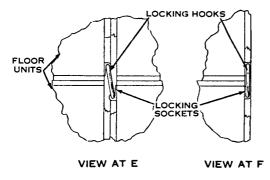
Layout and connections of floor for tent, frame-type, insulated, sectional.
